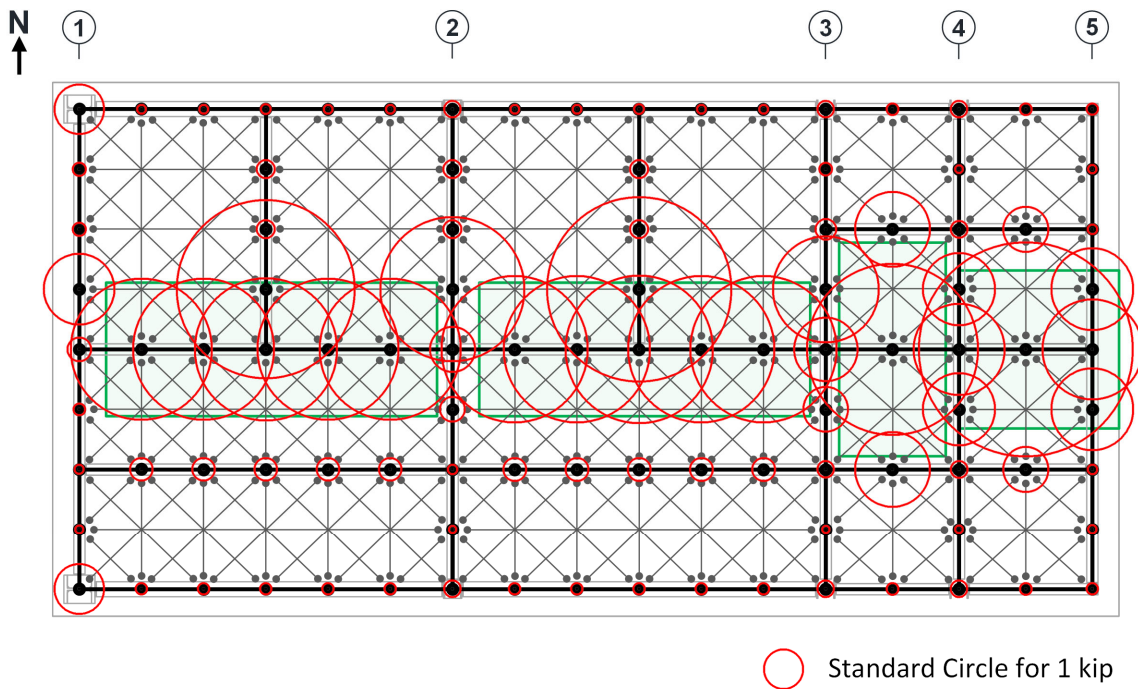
Layouts of Floor Beams and Slab Trusses for Modified Strip (MS) Model
